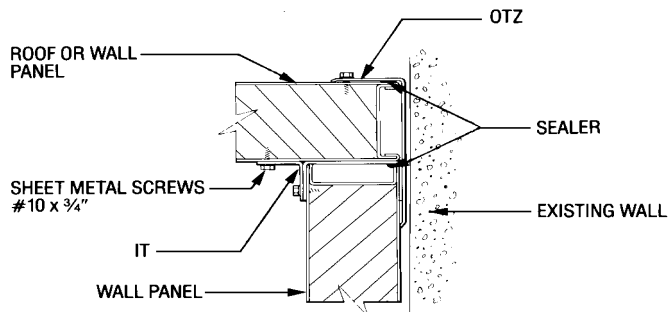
WALL PANEL TO BLDG. CEILING (ELEVATION VIEW)
